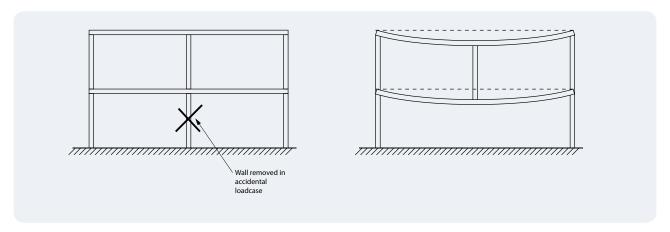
Removal of a load-bearing wall in a CLT building. (from WoodSolutions Technical Design Guide #39 Robustness in Structures)
